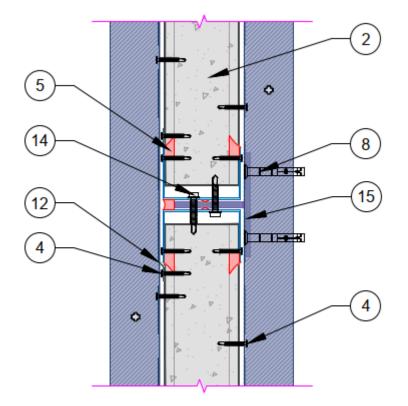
T-bracket connection in dual stack wall at landing/stair stringer
